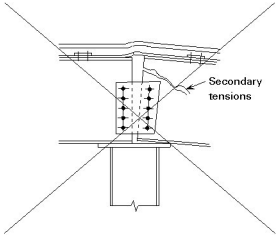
Local tension in the web adjacent to a diaphragm due to end rotation in simply supported girders
